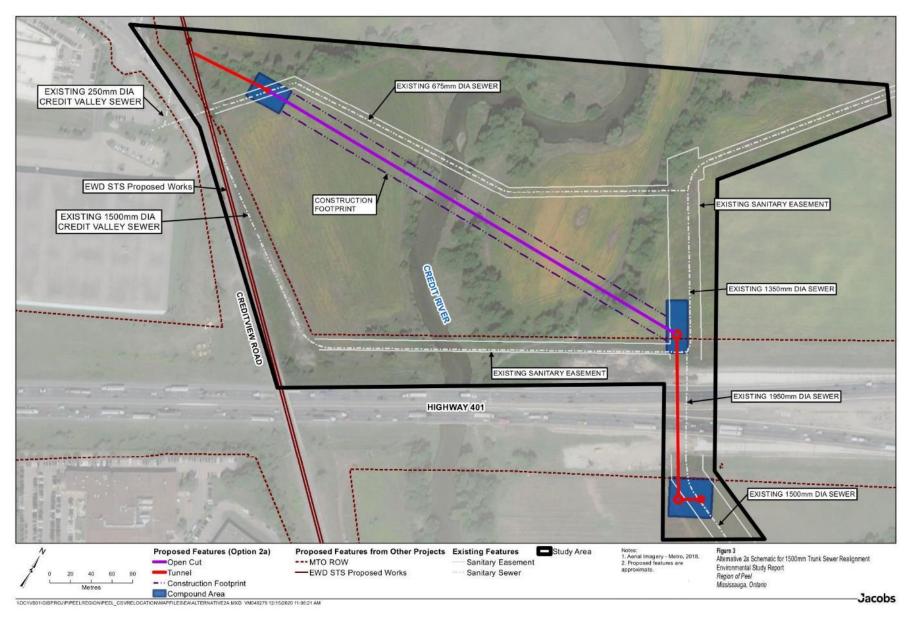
Alternative No. 2A: 530 m Open-Cut and 155 m Tunnel for Highway 401 Crossing
